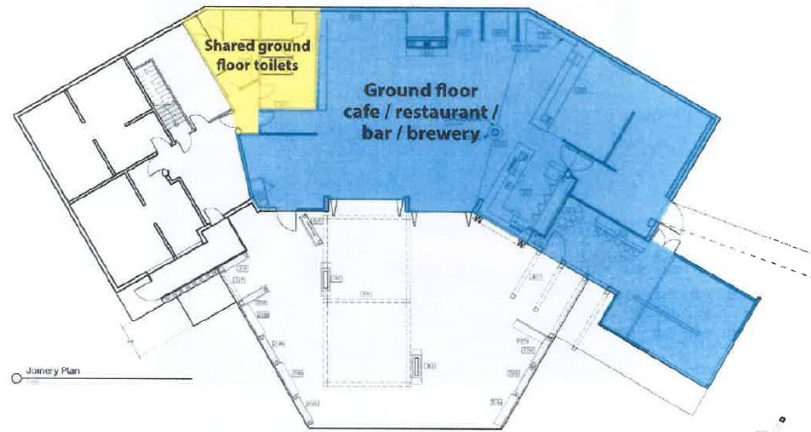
Ground Floor Lease Area of Cavell's Building Showing Location of Shared Toilets (yellow) and the Go Orange (now Real Journey's Limited) Rafting Lease (White)
